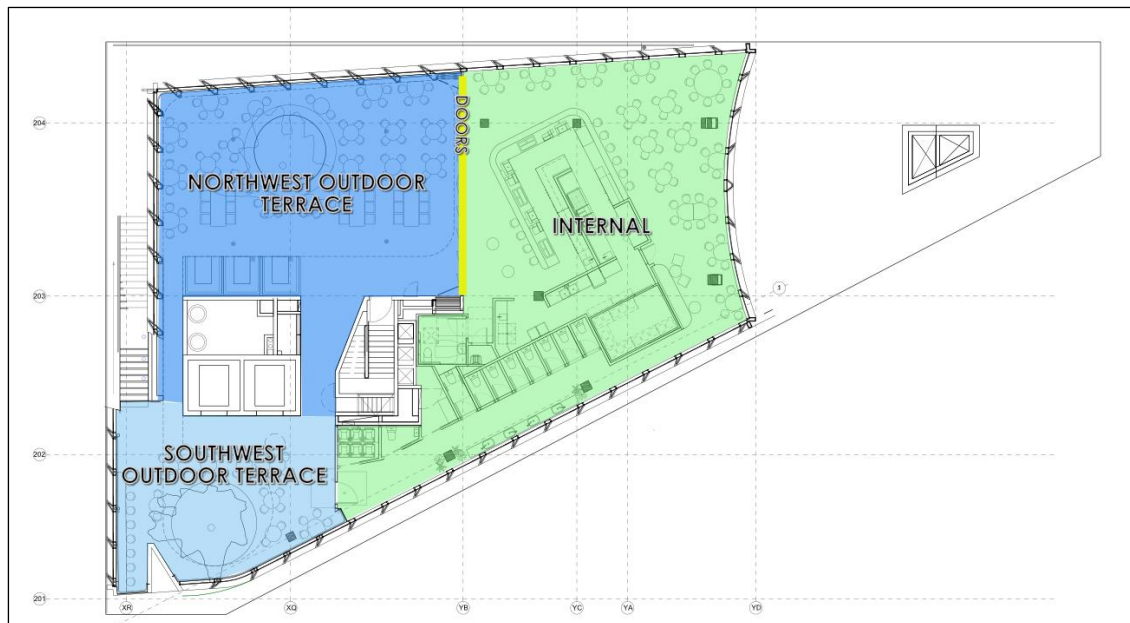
Floorplan of the Premises (Source: Techne Architecture + Interior Design / Design Collaborative)
